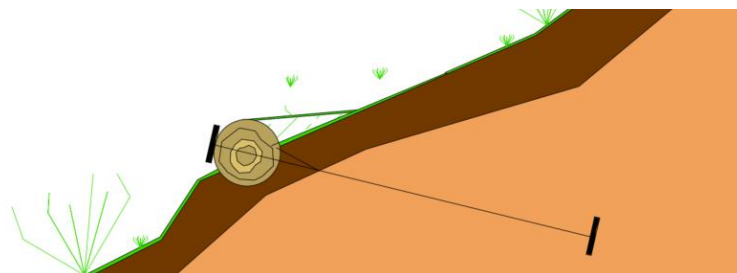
Cross section showing ground anchored logs/ sleepers and benching behind (WWLA 2025)
